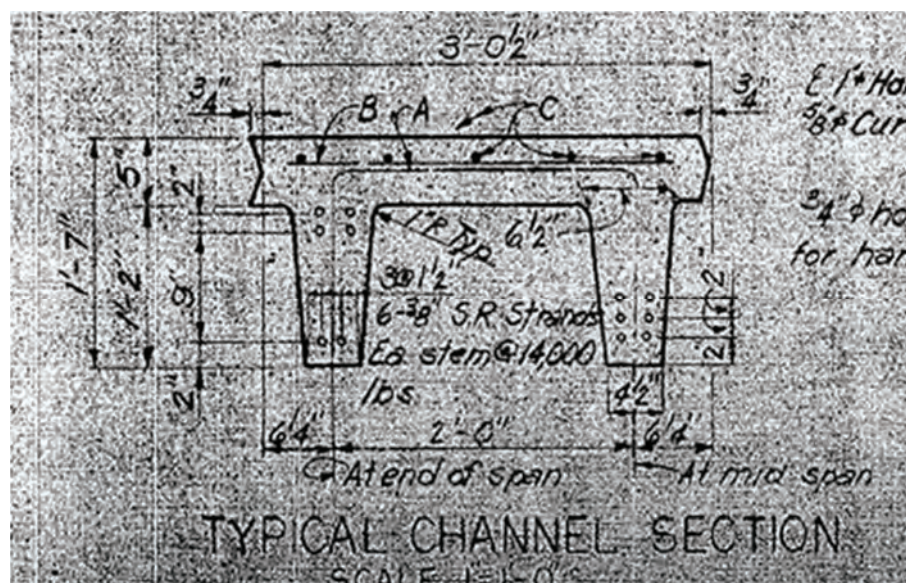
Wide-Leg Channel Beam Typical Section (pre-1976)
